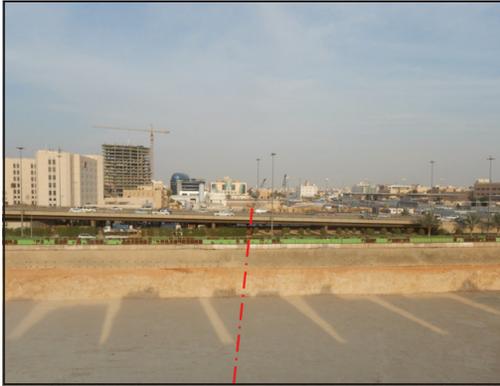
Running tunnel (dashed red line) and its proximity to above ground buildings and viaduct
